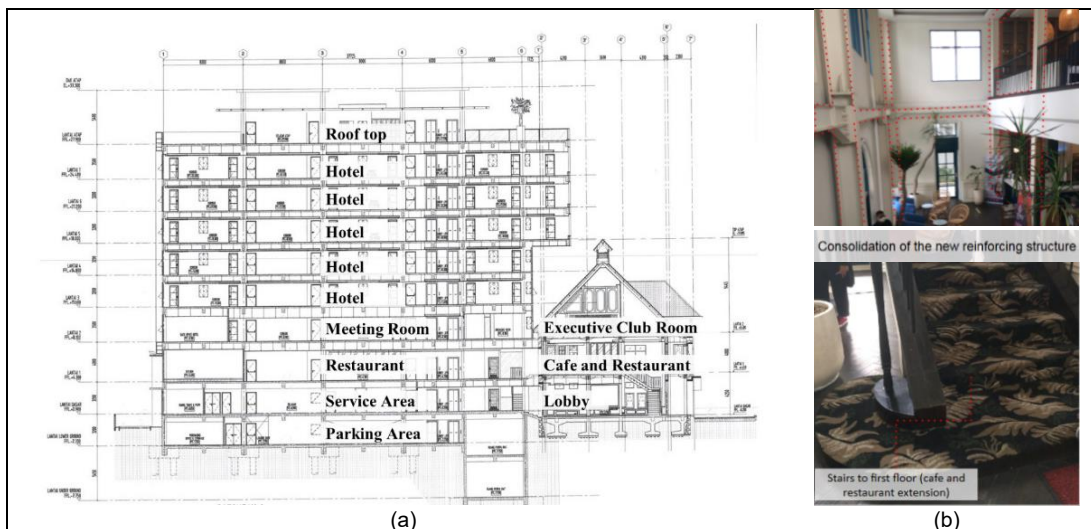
(a) Section Drawing of Vasaka Maison Teraskita Hotel, (b) A White Exposed H-Beam Steel Structure and Additional Stair at The Old Structure
